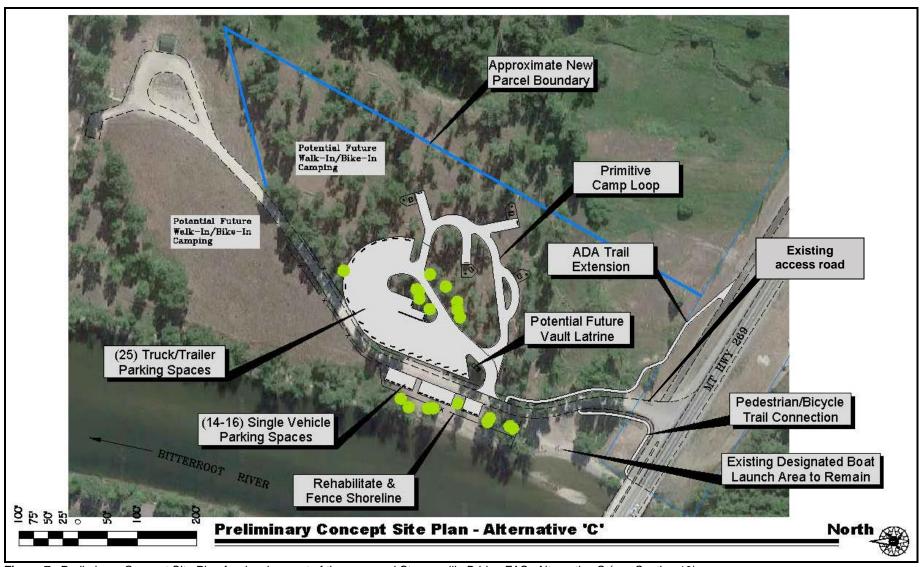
Preliminary Concept Site Plan for development of the proposed Stevensville Bridge FAS; Alternative C (see Section 10).
